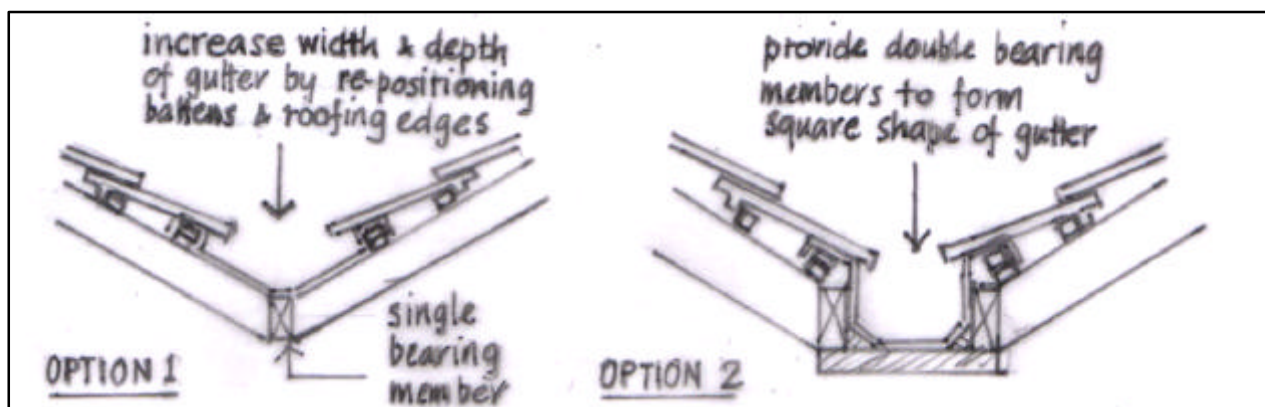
Valley gutter options (applicable for tiled roofs and corrugated sheet roofs)
